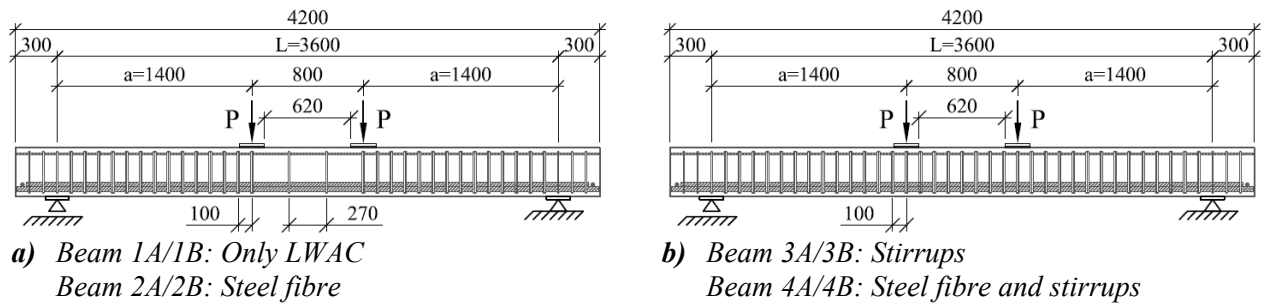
Loading arrangement, confinement configurations and dimensions (in mm)
